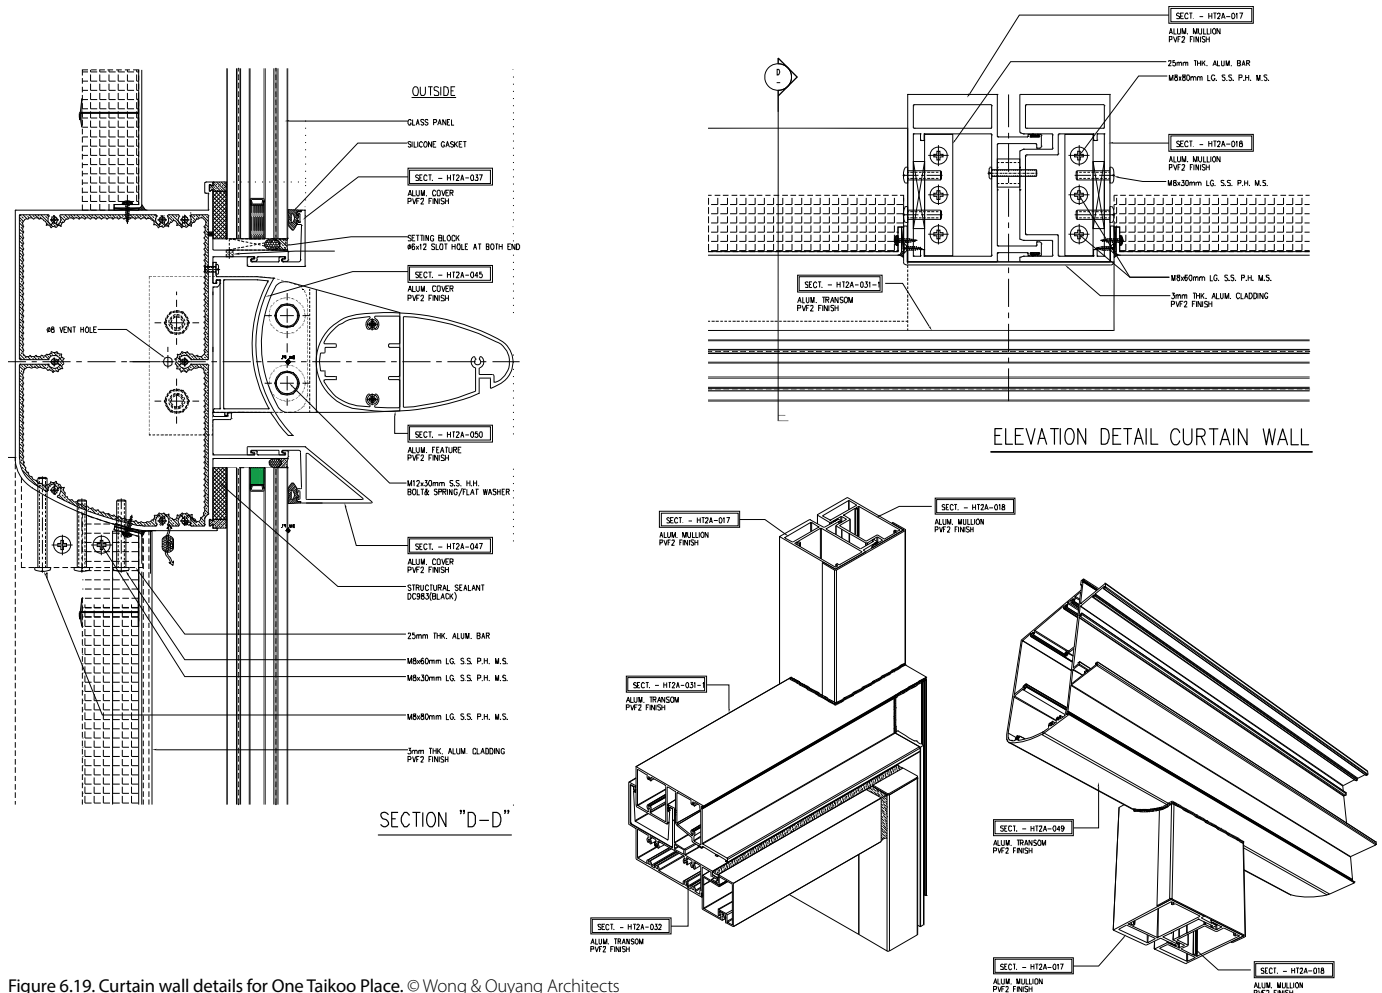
Curtain wall details for One Taikoo Place. © Wong & Ouyang Architects
